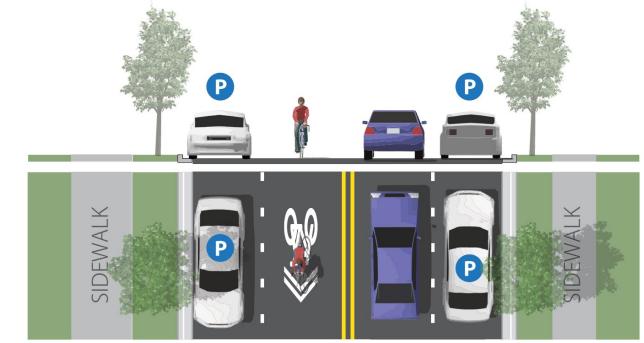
Lindsay Street and Houston Street | Proposed Two-Way Cross-Section
